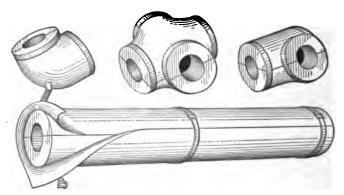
Moulded 85% Magnesia Covering for Pipe and Fittings.
